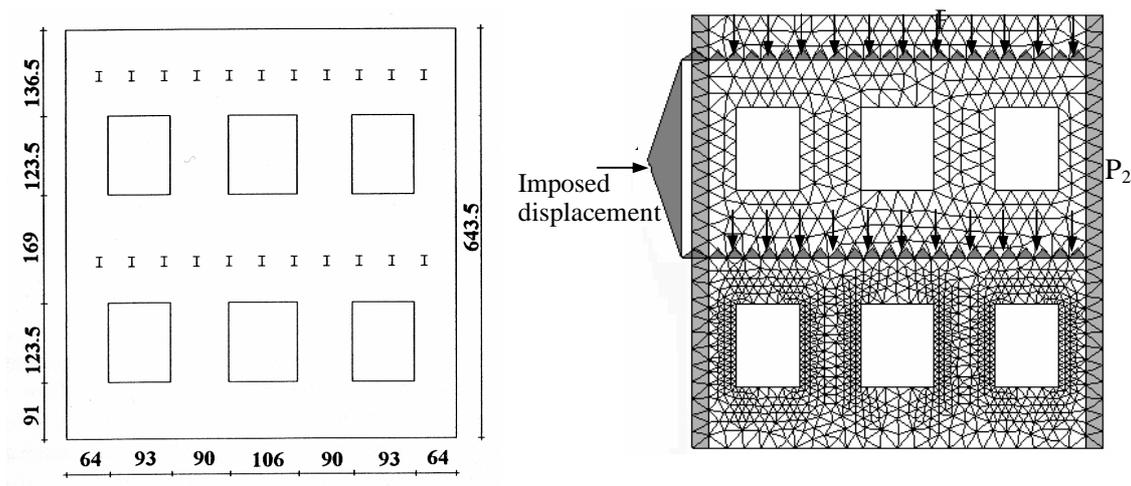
geometry of the wall B (dimension in cm) and finite element mesh of the large scale wall
